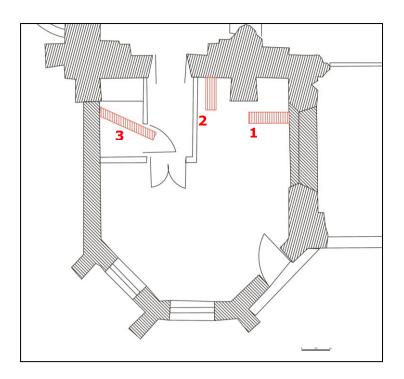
Plan of showing location of Trenches 1, 2 and 3.
